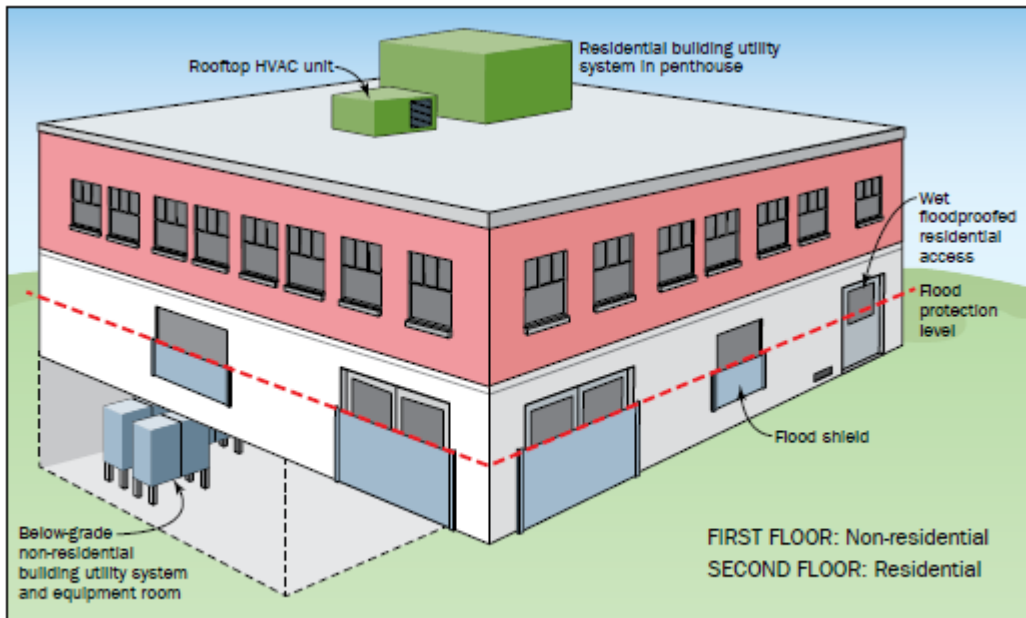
Mixed-use building with non-residential building utility systems and equipment in a dry floodproofed below-grade equipment room and elevated systems that serve the residential uses
